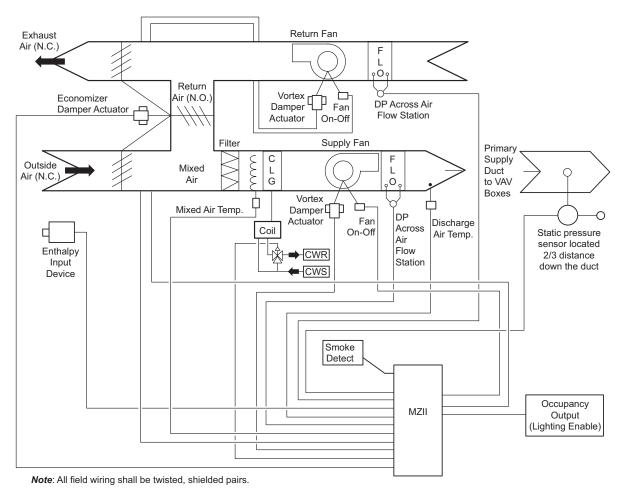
MZII Control Schematic of a Typical Fan Tracking VAV Air Handling System.
